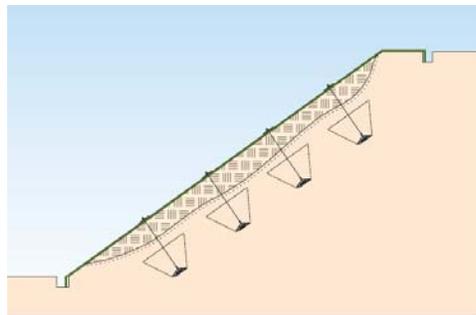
Platipus® anchors designed for shallow slope stabilization (Platipus, 2007).
